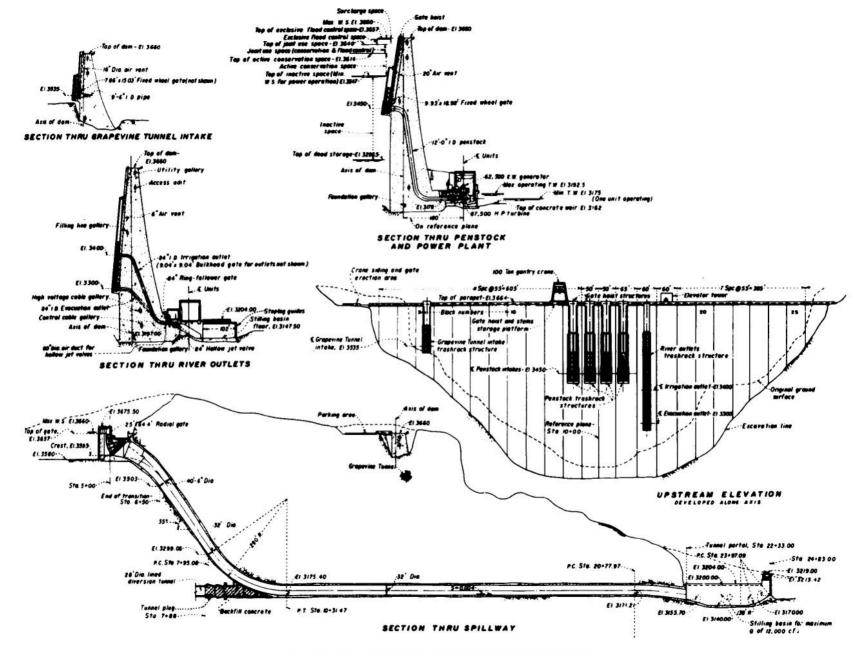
Plan and sections of Yellowtail Dam. (sheet 2 of 2)
